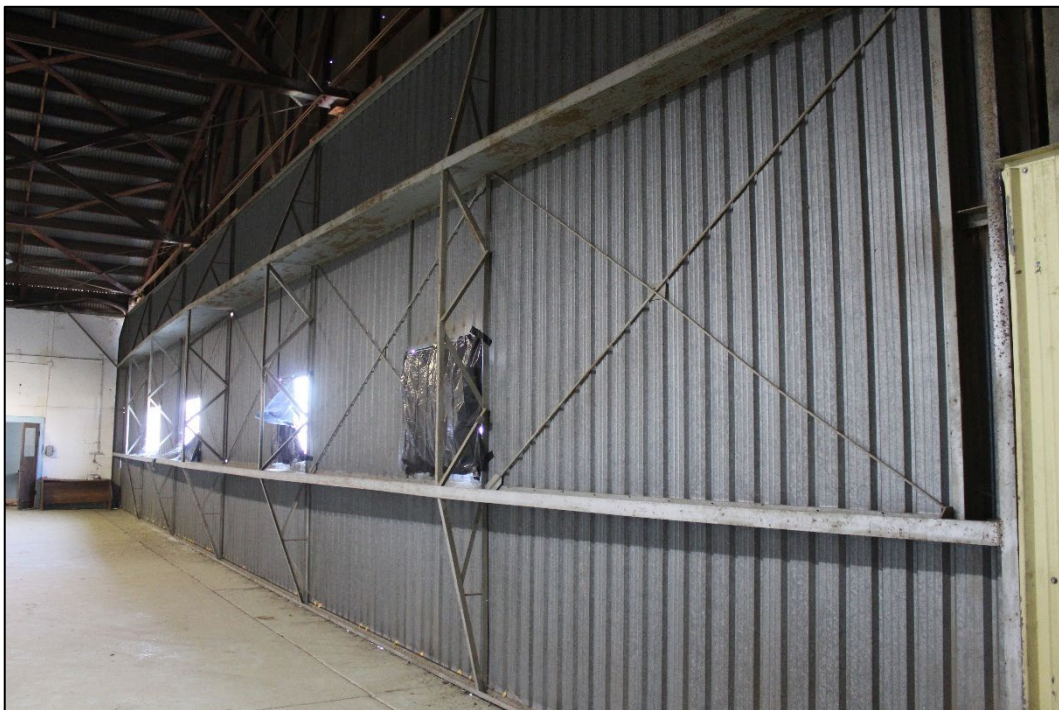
Interior of hangar with hangar door closed, facing west (Stantec, 2025).
